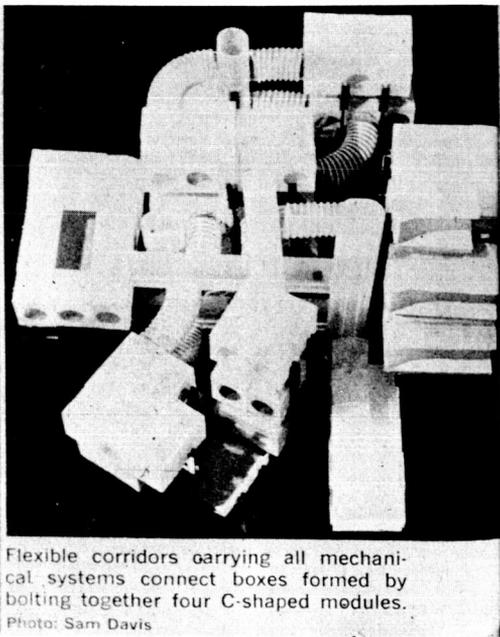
Flexible-corridor dwelling (courtesy of Progressive Architecture).
